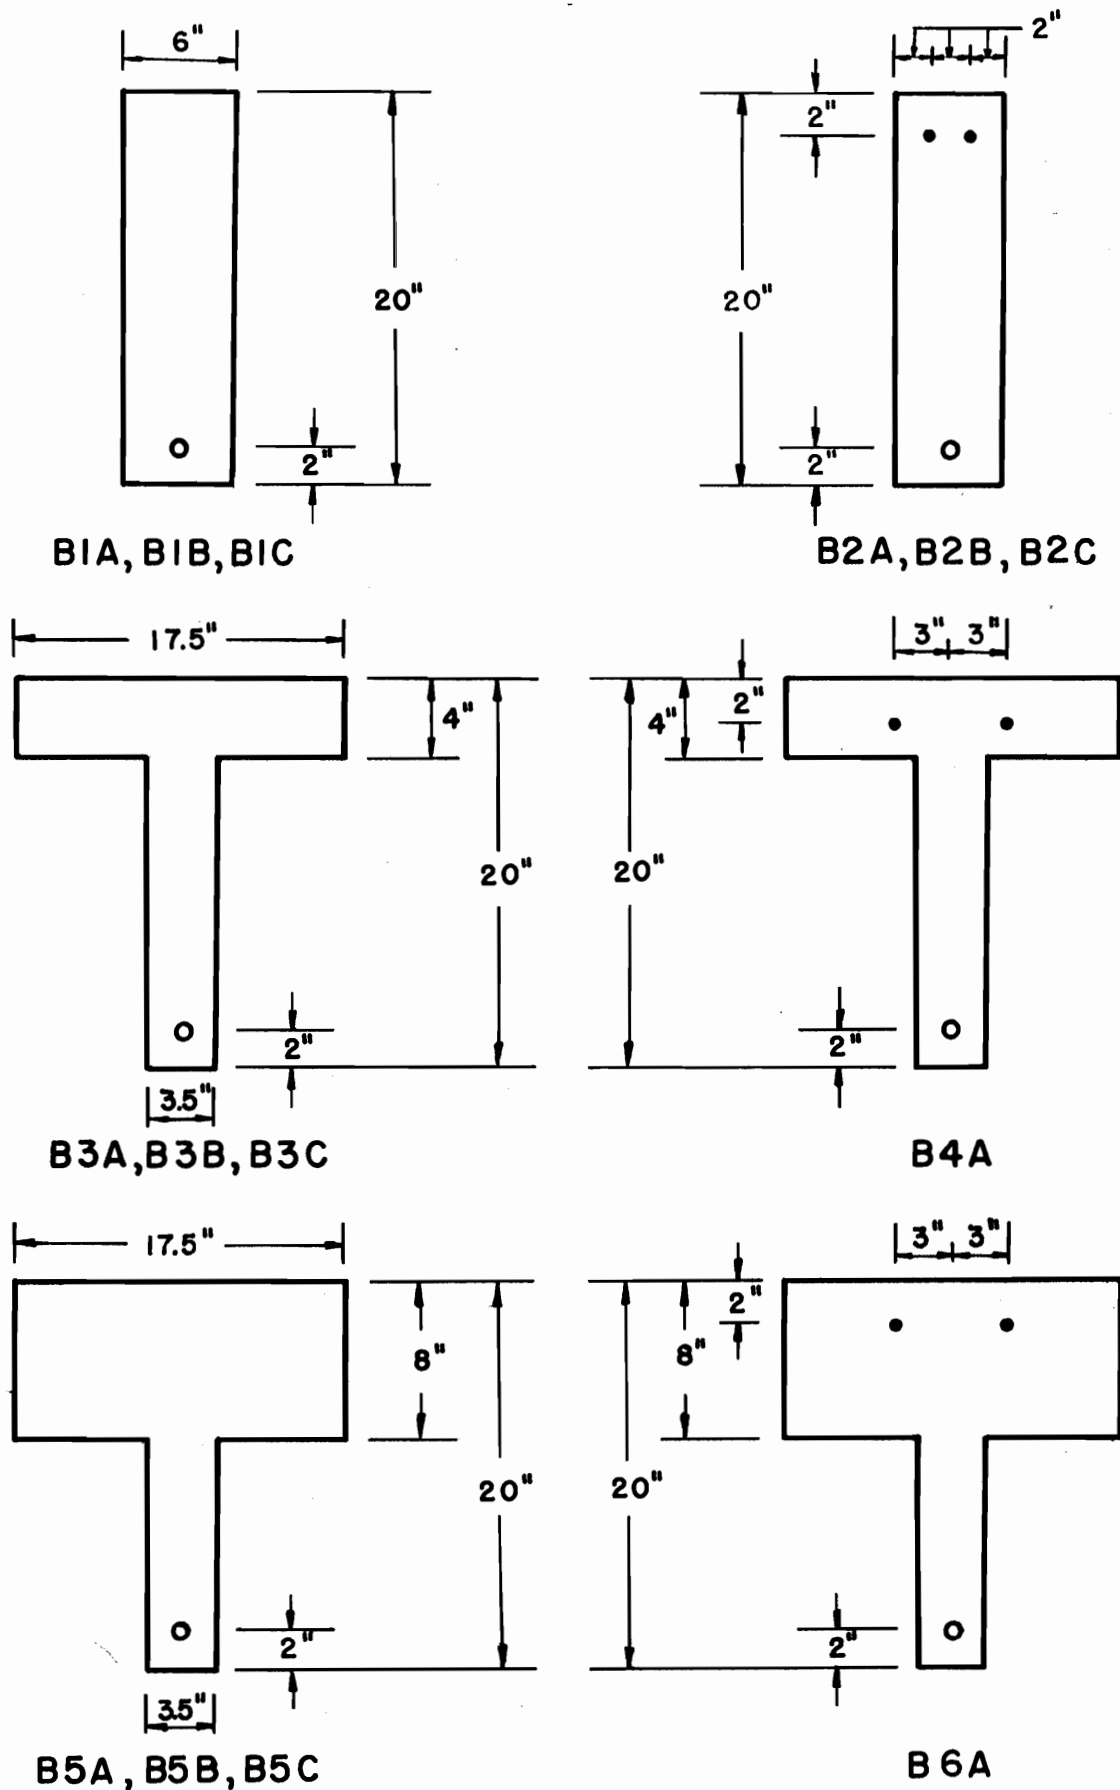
SECTION PROPERTIES AT MIDSPAN OF TEST SPECIMENS
